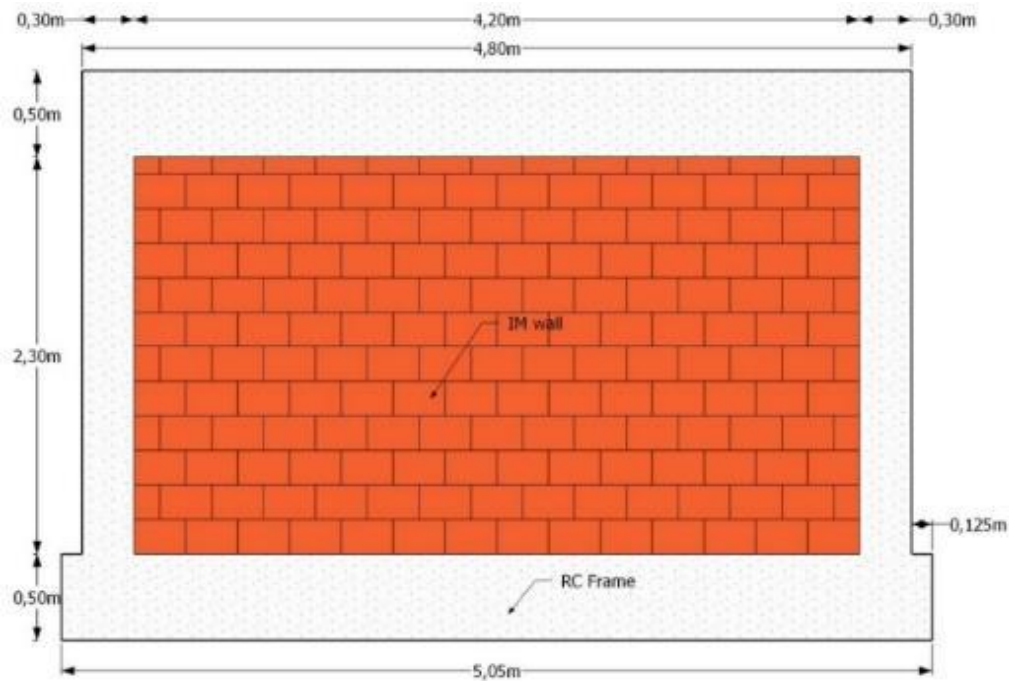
Infilled RC frame specimen general dimensions (units in meters).
